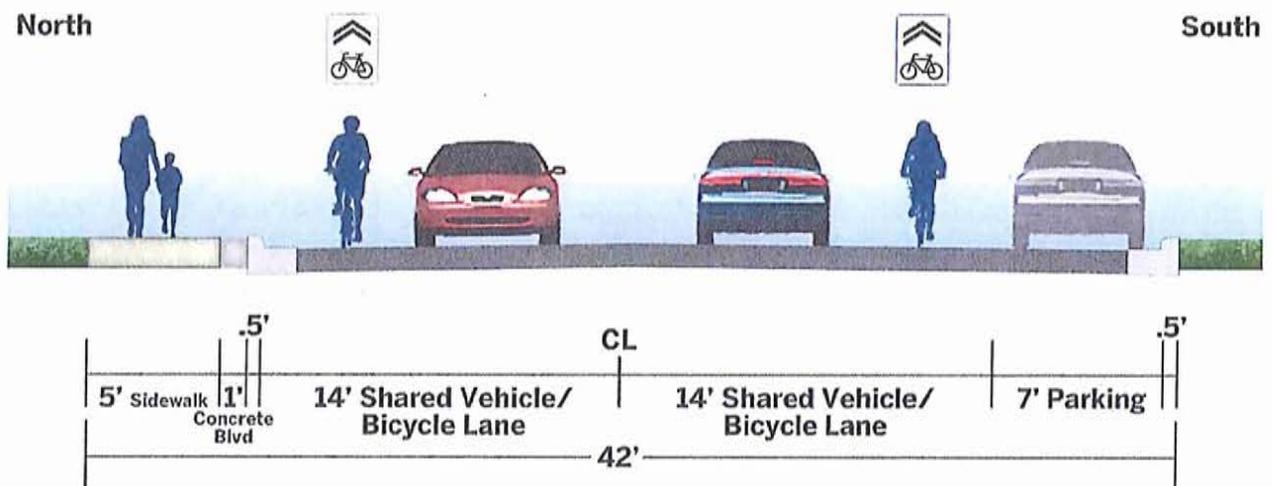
54th Street East Segment Typical Section – from Halifax Avenue to France Avenue
